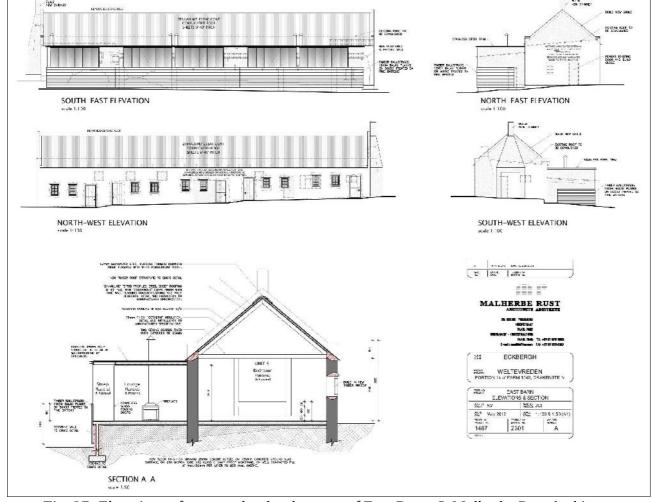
Elevations of proposed redevelopment of East Barn. © Malherbe Rust Architects
